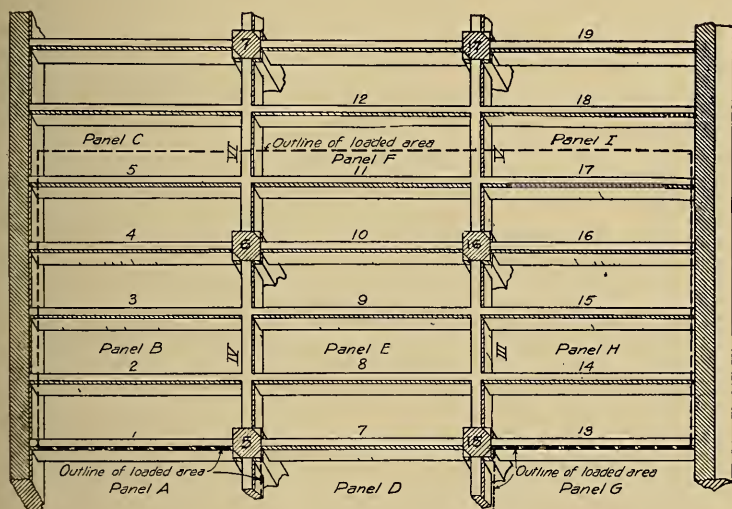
CABINET PROJECTION SHOWING BEAMS AND GIRDERS AND POSITION OF TEST CRACKS.
